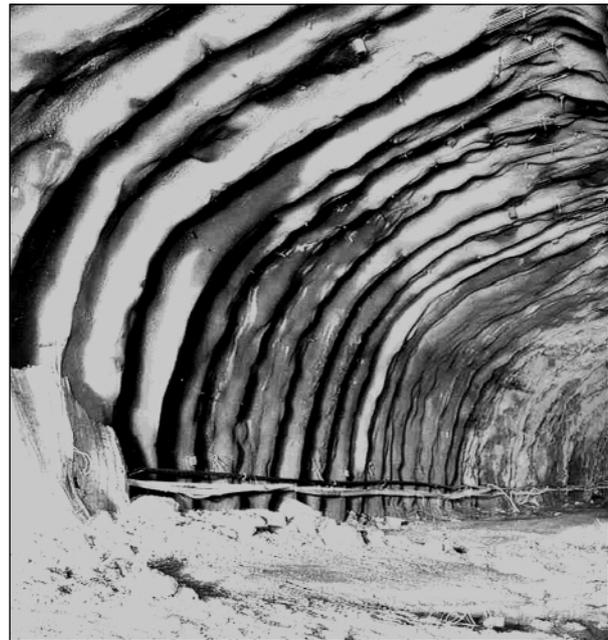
Reinforced ribs of sprayed concrete at Nationaltheateret railway station
